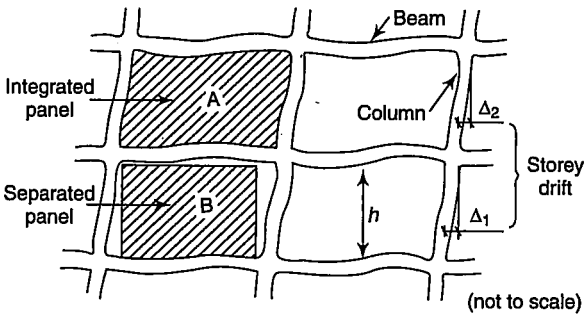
Diagrammatic elevation of structural frame and non-structural infill panels
